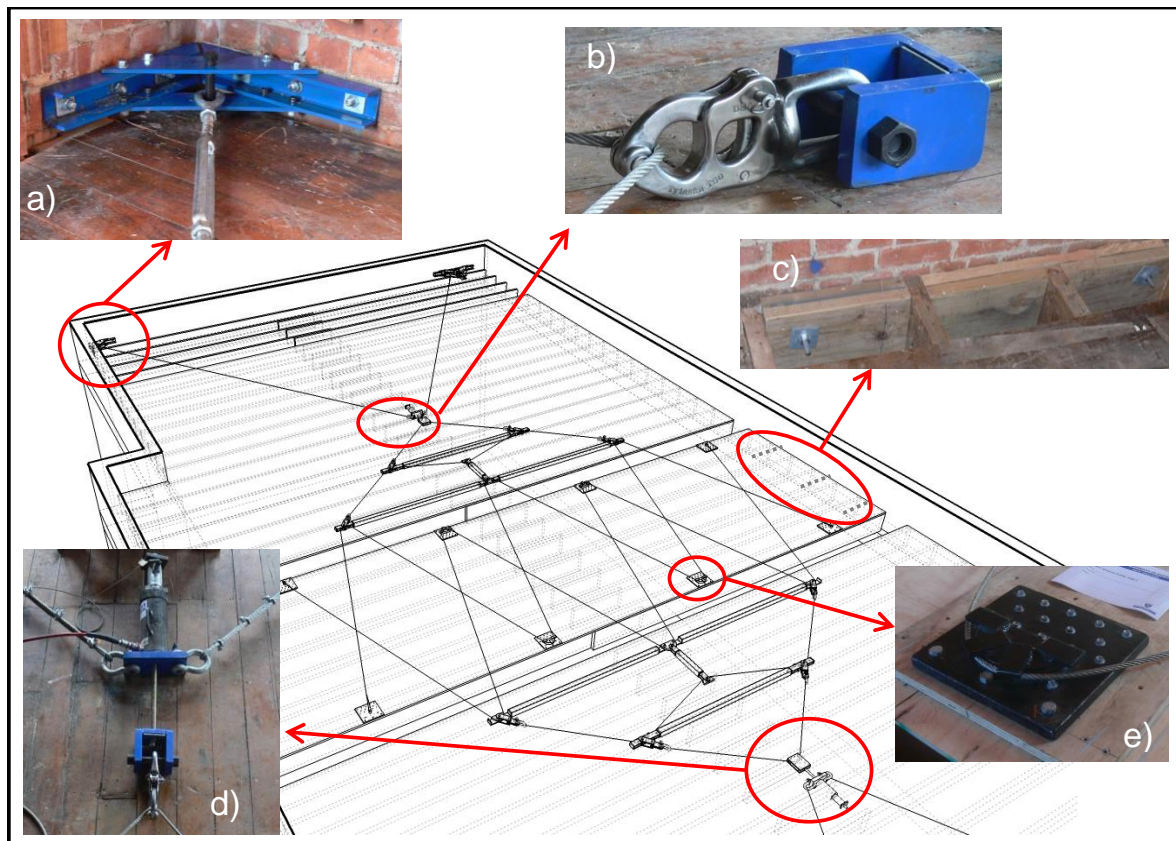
Test set-up for Whanganui diaphragm test; a) wall connection bracket; b) snap shackle for instantaneous load-release; c) new shear anchors; d) hydraulic actuator; e) central loading plate.
